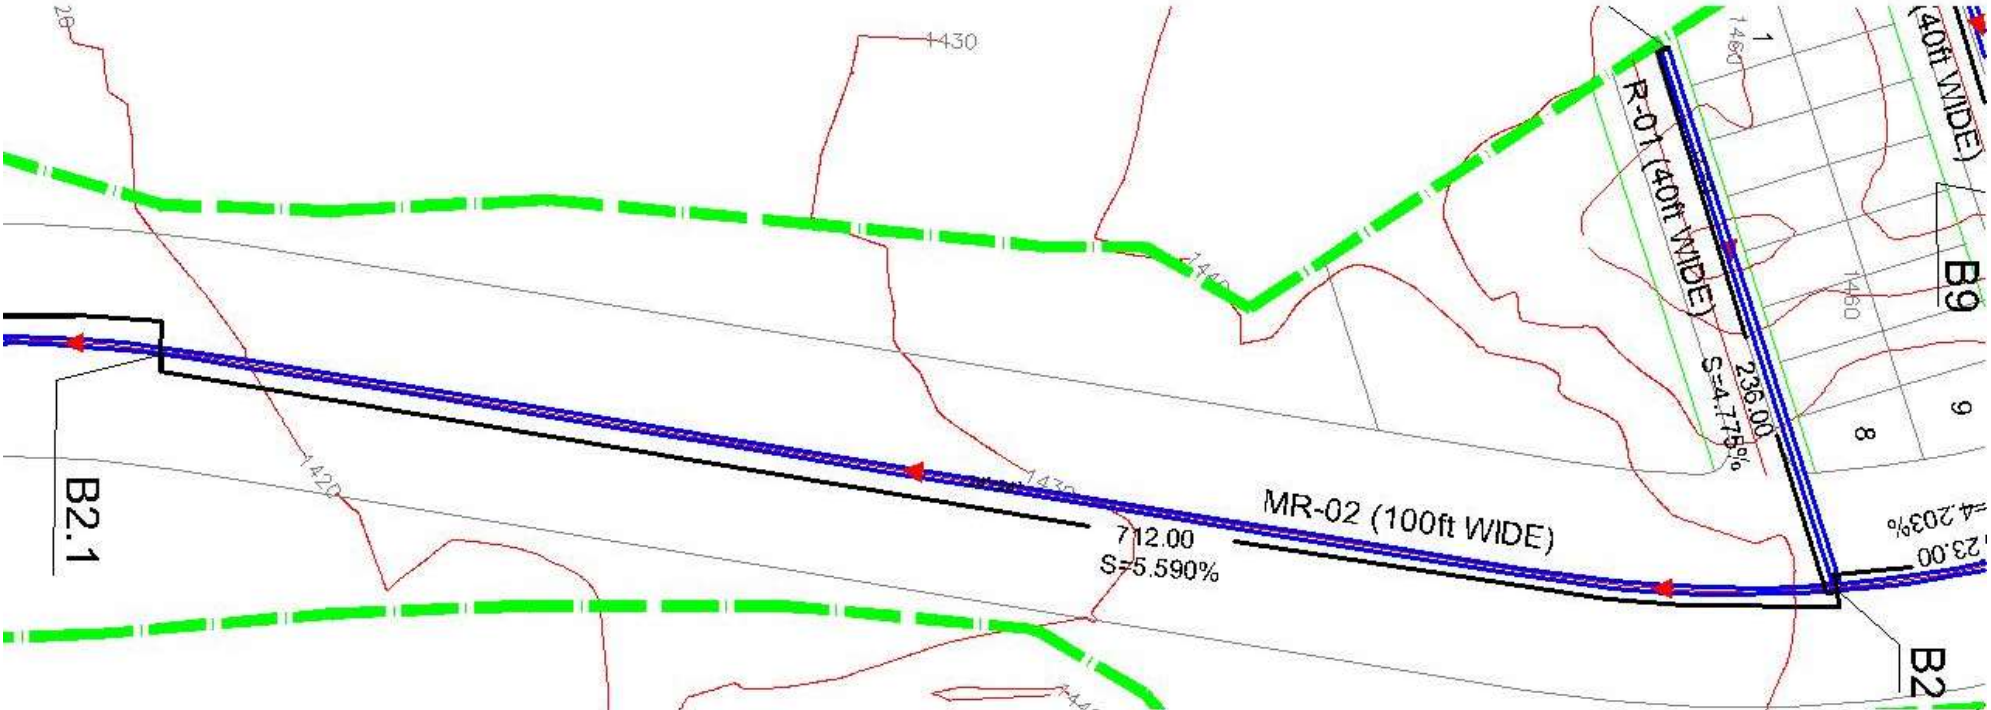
Storm drainage layout plan of Sub-catchment-1 part four (B2 to B2.1)
